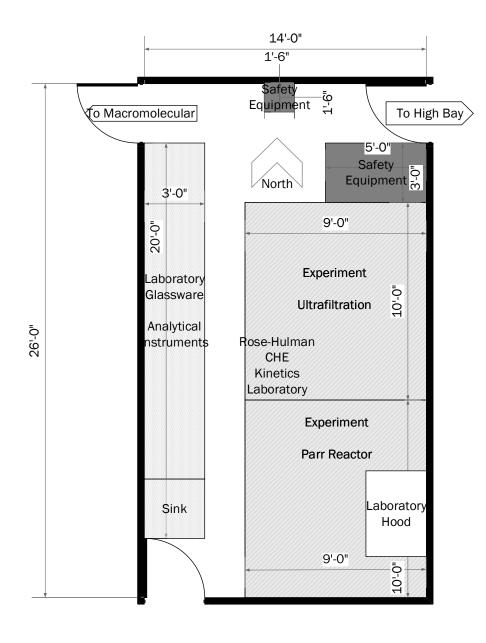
Kinetics Laboratory (O-202) Floor Plan
